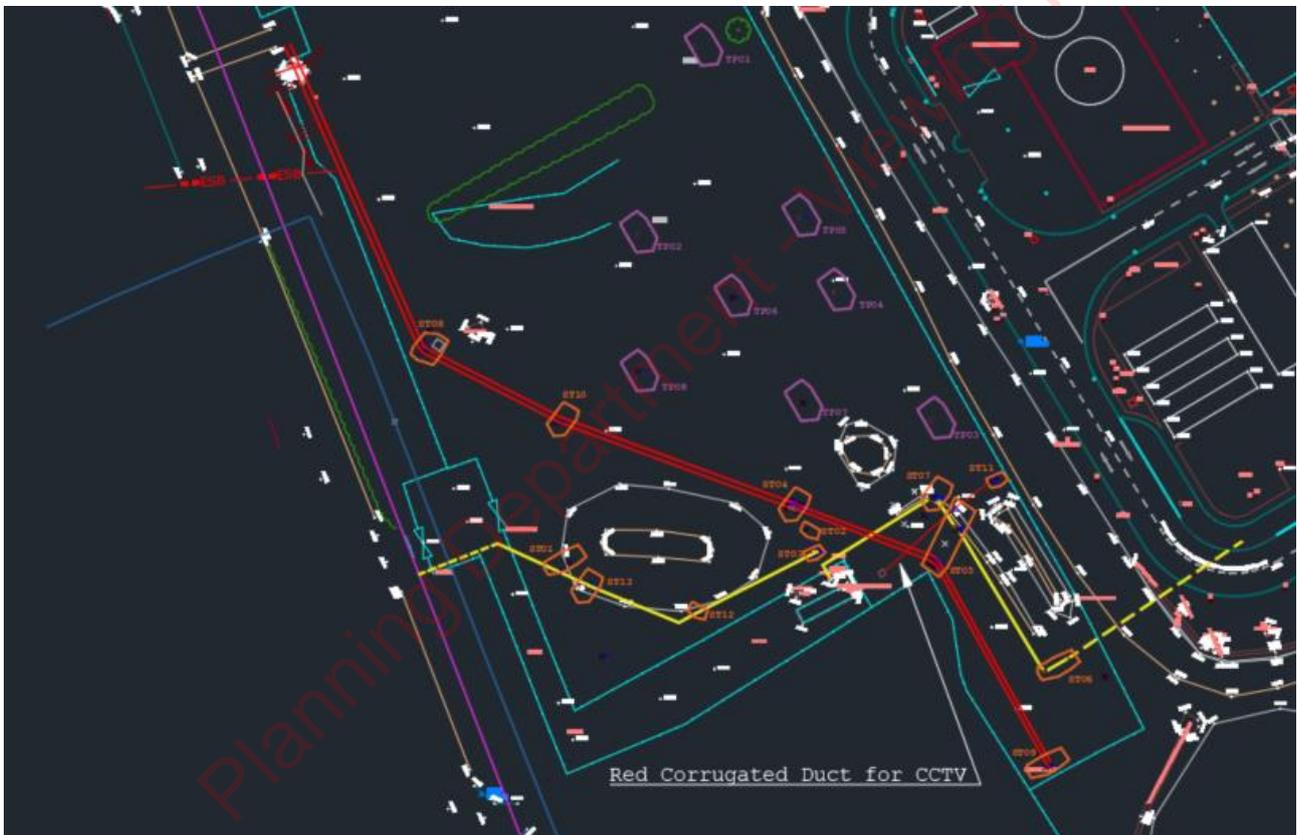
Site :Layout showing Cofirmed Service Locations and Site Investigation Excavations
